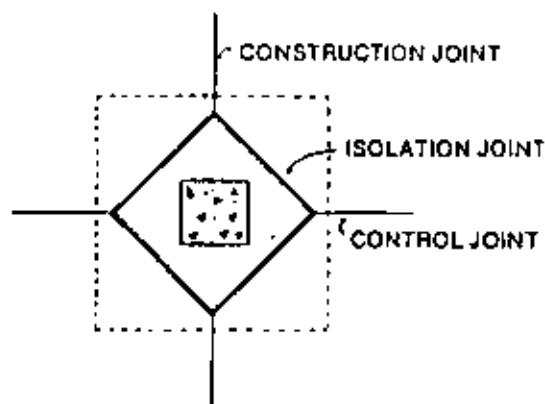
Isolation joints around columns are circular or diamond shaped.
